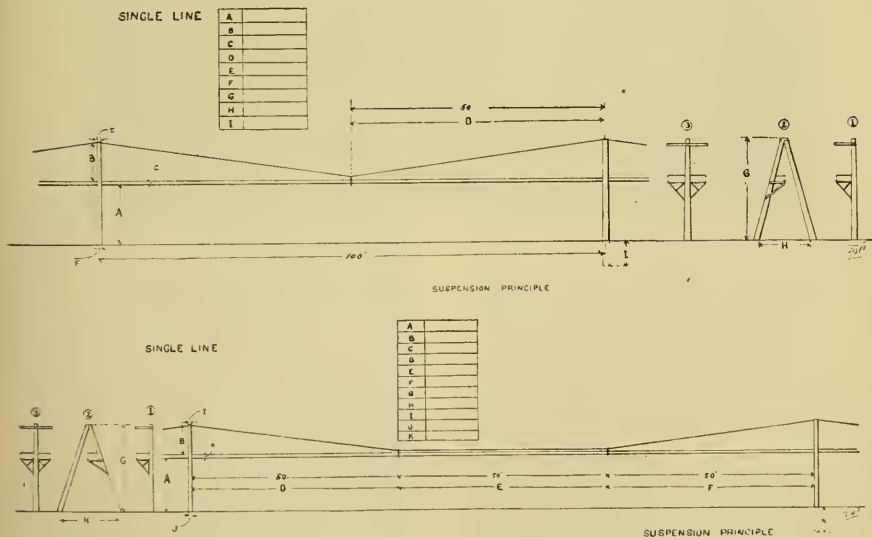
OTHER FORMS OF POLE CONSTRUCTION, SHOWING SINGLE AND DOUBLE LINES. The track cables are supported by another cable, which is called the suspension cable. It would be impossible with long spans to stretch a cable so that under load there would not be considerable deflection. This deflection or sag is taken up by the suspension cable. Not only can we make the track cable horizontal, but even higher in the center than at the terminals.
